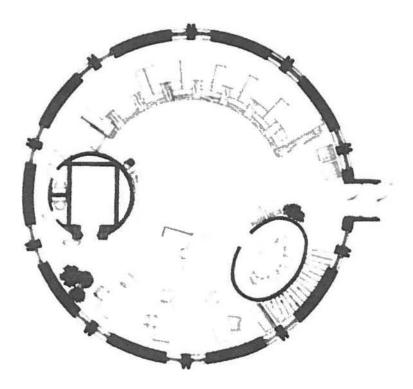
Floorplan of main / second floor, original floorplans were not found. From *Interiors* Magazine, April 1965.
